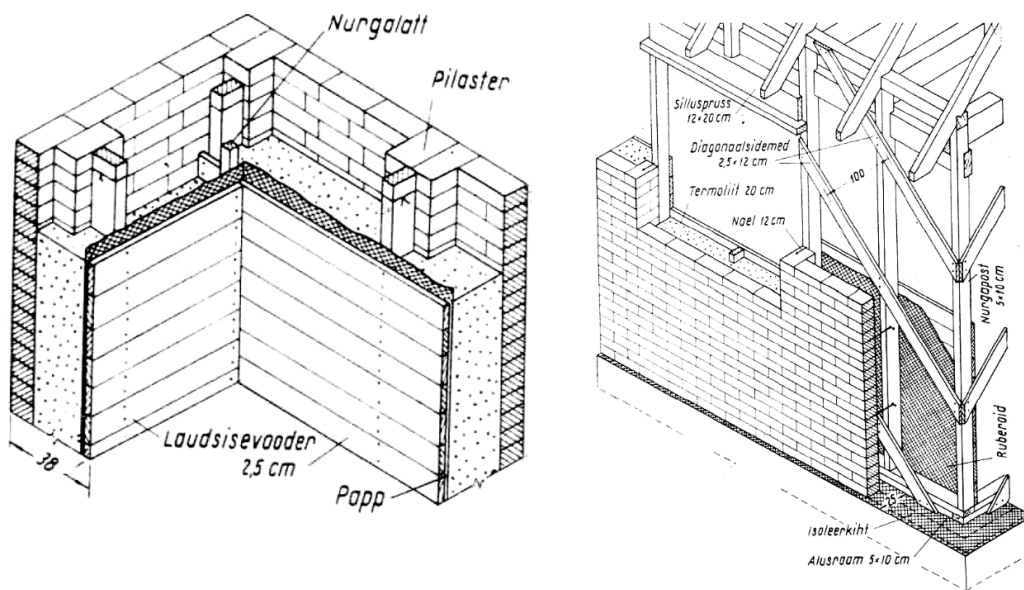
Examples of insulated brick structures incorporating both brick and timber structures (left to right: Harju wall, Nõmme wall) (Veski, 1969)
